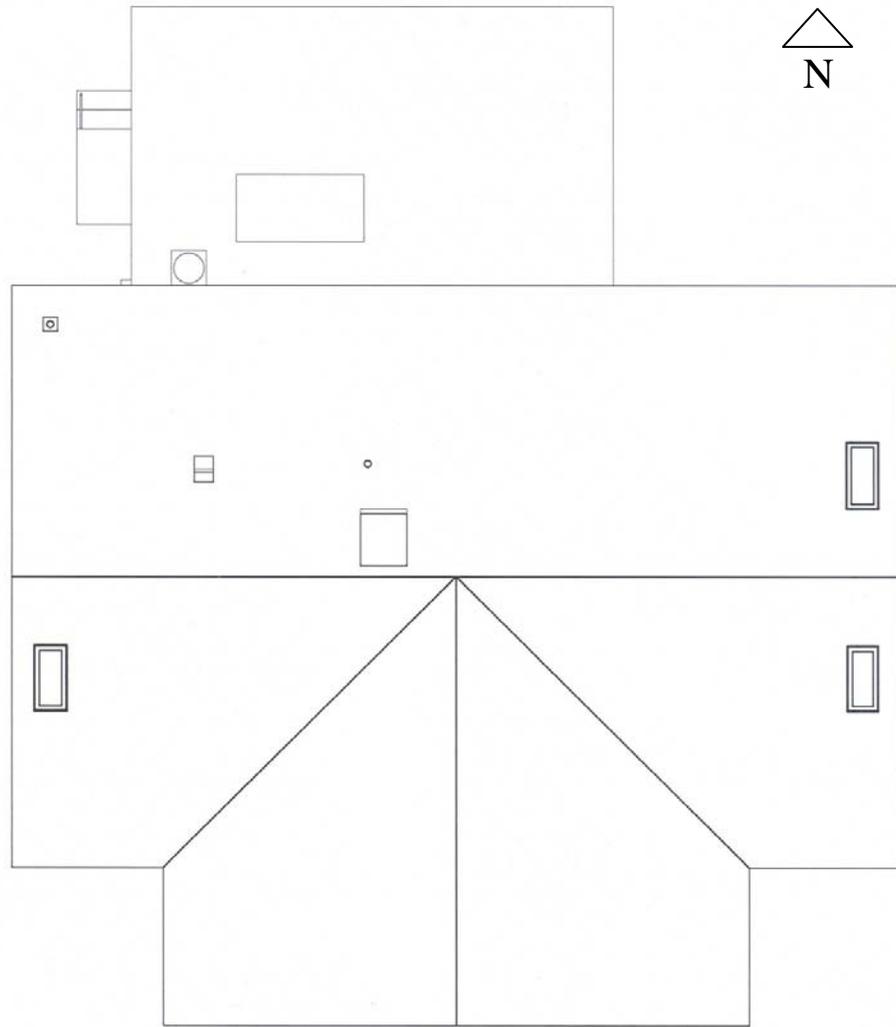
Roof plan of the Hunt House, December 2006. Not to scale.
